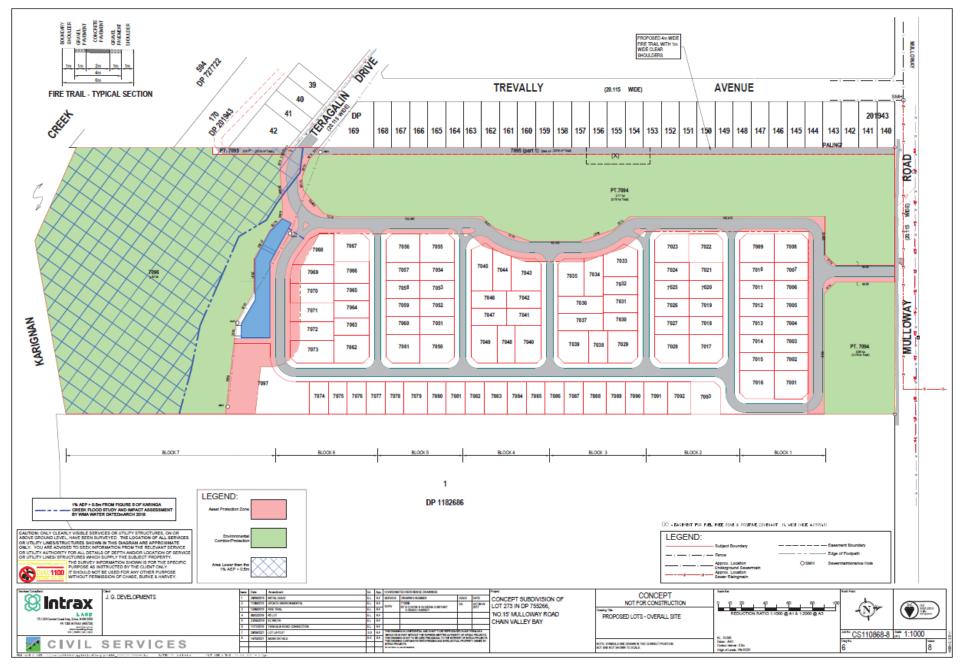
Proposed Lot Layout (source: Intrax Drawing no. CS110868-8 DWG no. 6- Issue 8 Dated 14/10/2021)
